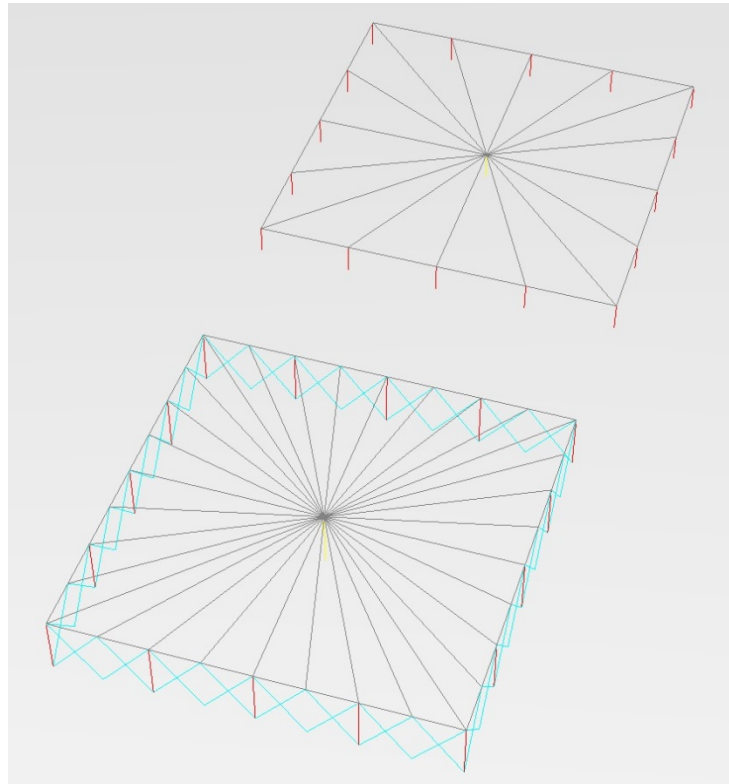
Space frame model – single floor configurations between intervals and at intervals
